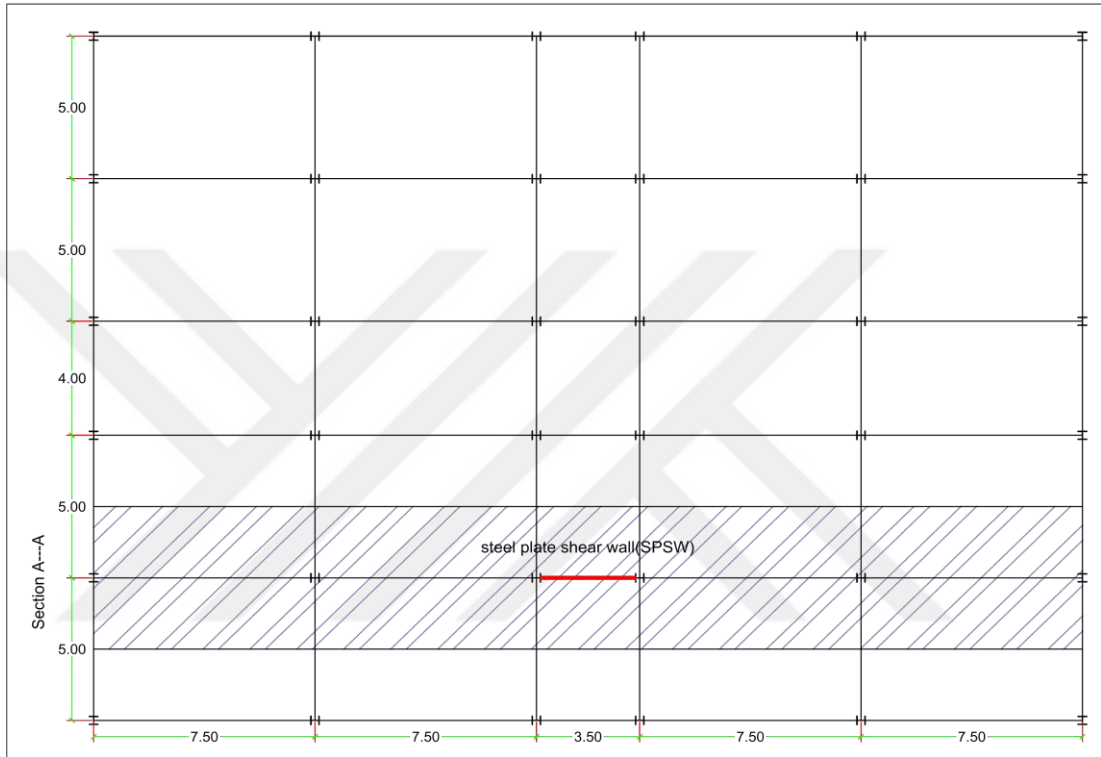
Plan of 2, 4, 6, and 8 story steel buildings with steel plate shear walls
